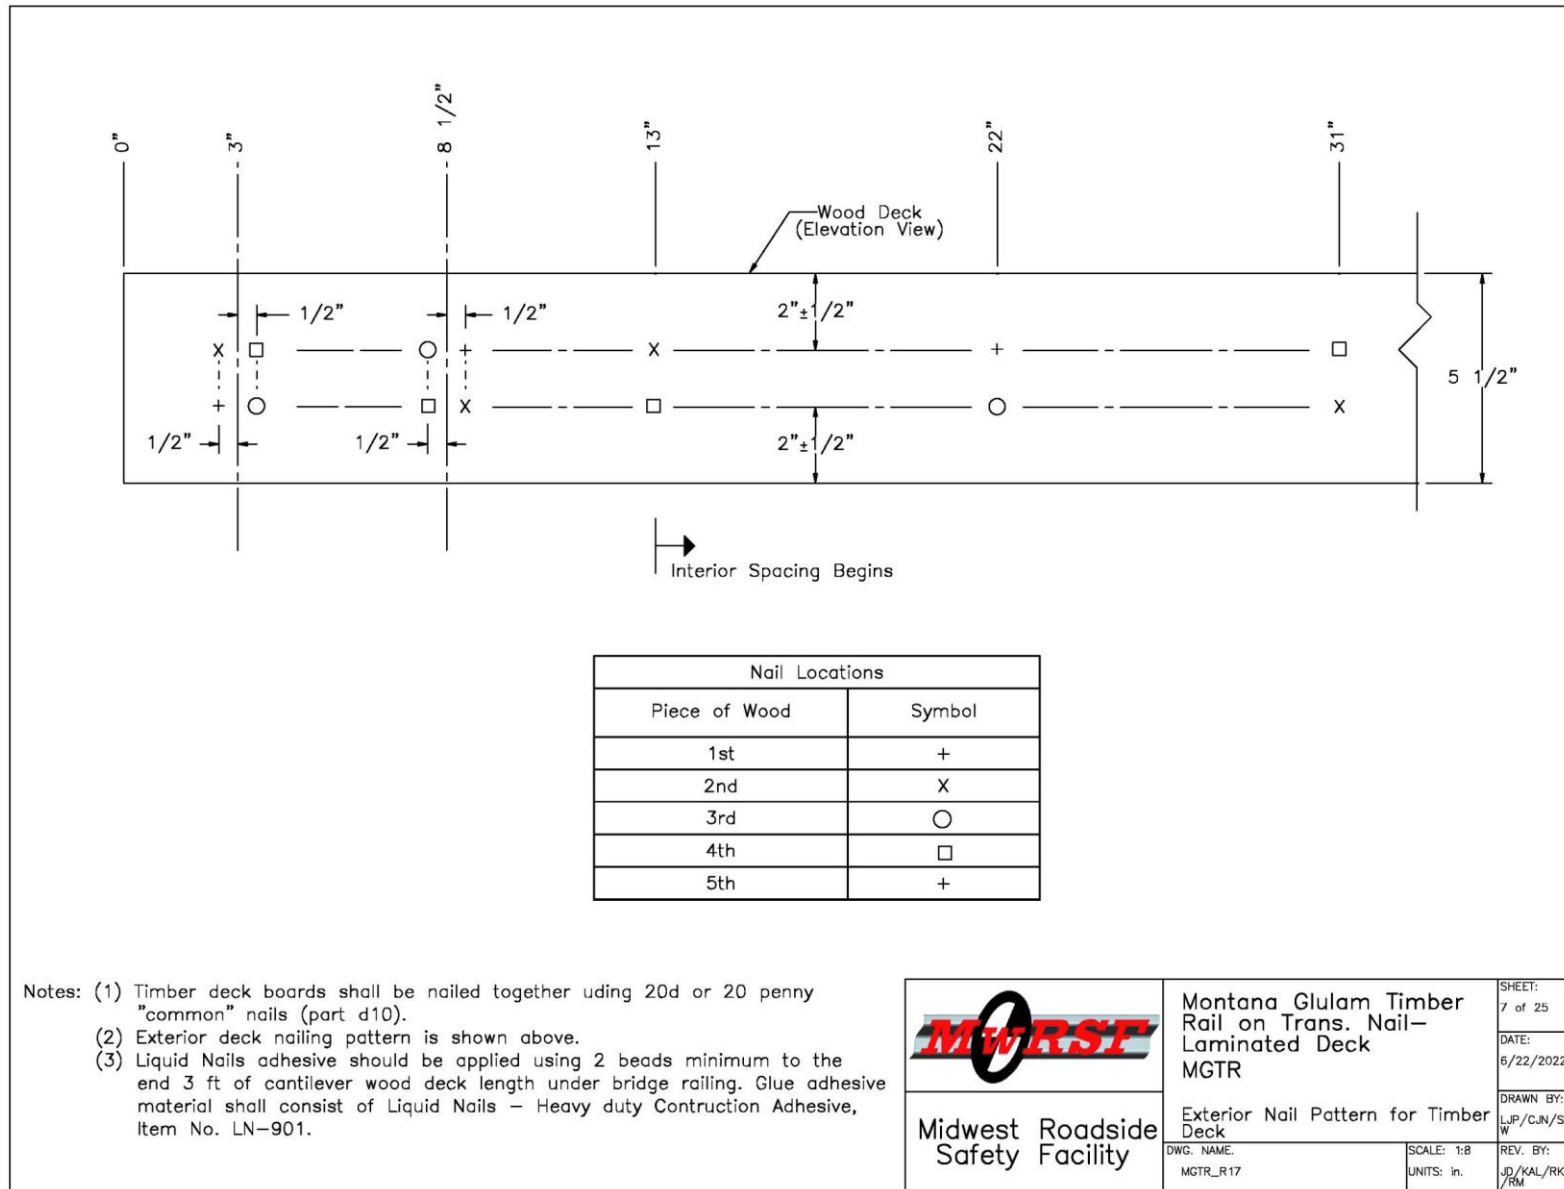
Exterior Nail Pattern for Timber Deck, Test Nos. MGTR-1S and MGTR-1D
